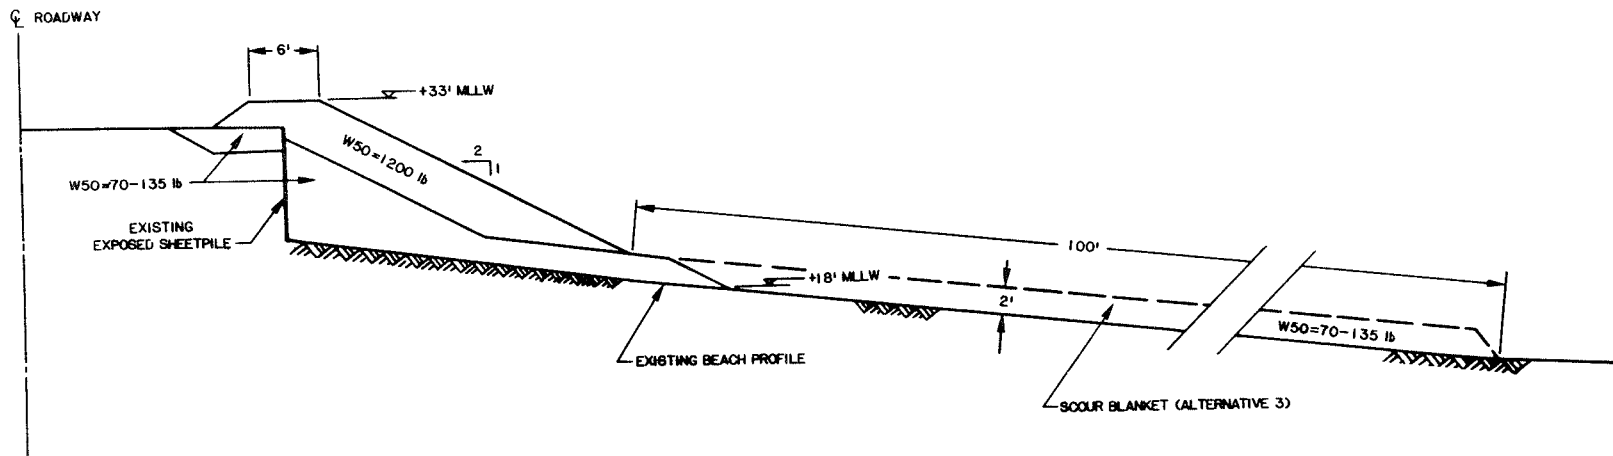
Proposed revetment and scour blanket at Beach Profile 47
